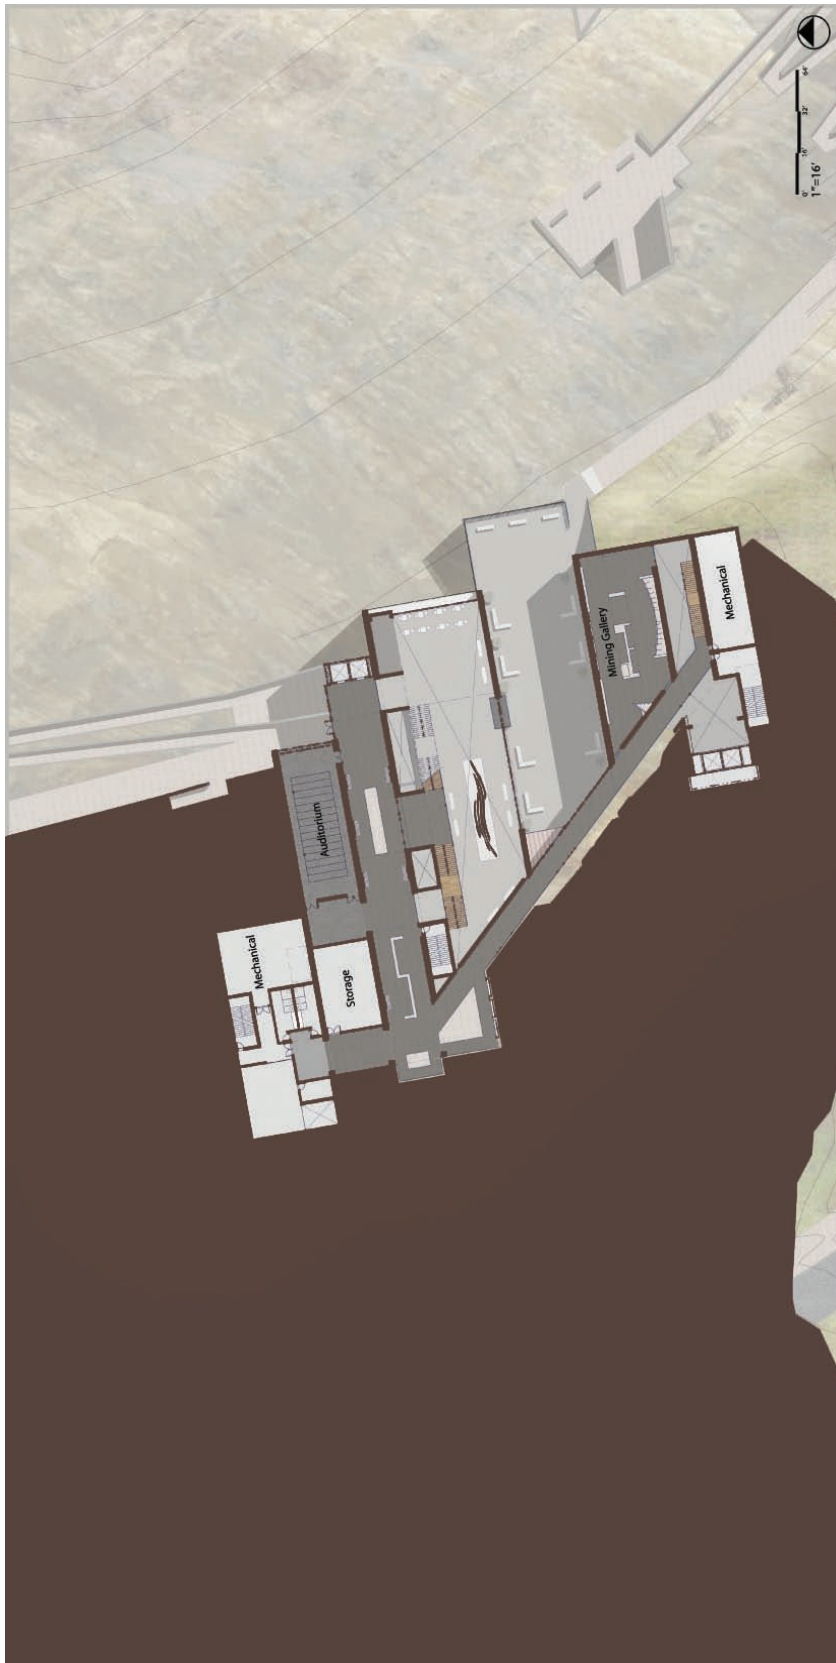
Building plan, first level below the main entry [Drawing by Emily Childs]
